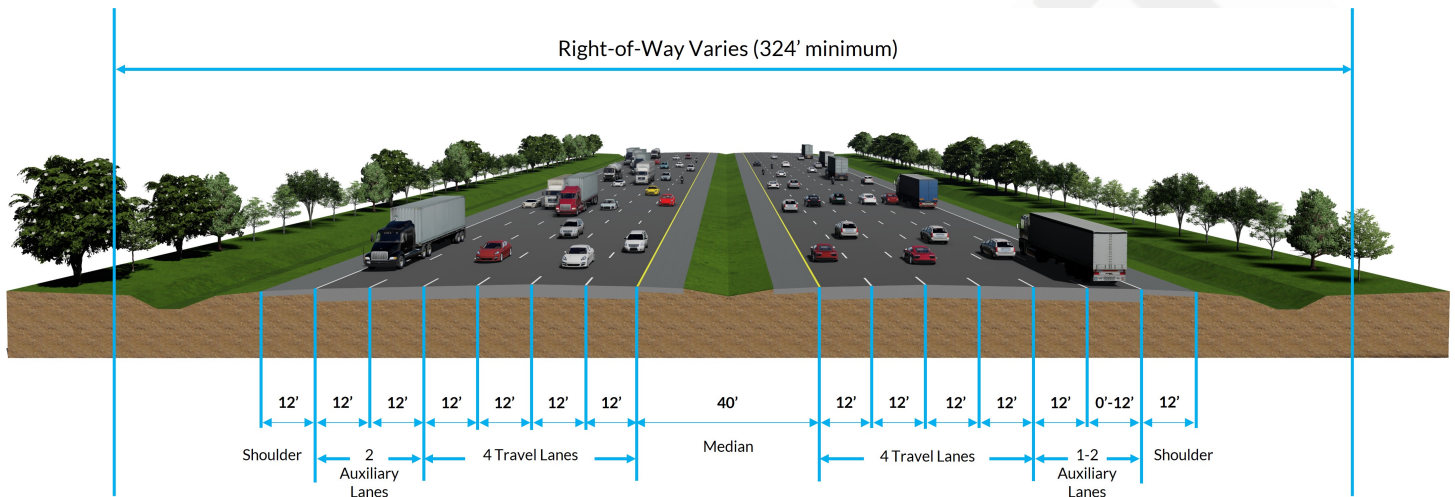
I-95 from I-295 to Southside Boulevard
